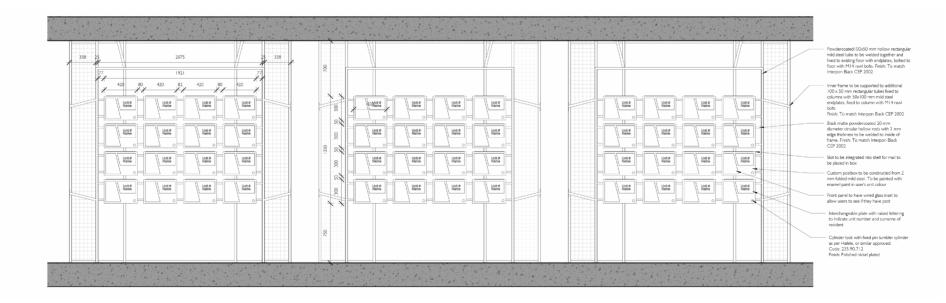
Front Elevation of post boxes, not to scale (by Author)
